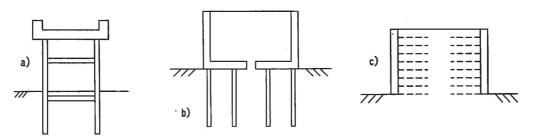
a) Elevated RC framework structure; b) backfill supported by conventional type cantilever RC retaining walls; and c) GRS-RW with a full-height rigid facing.
